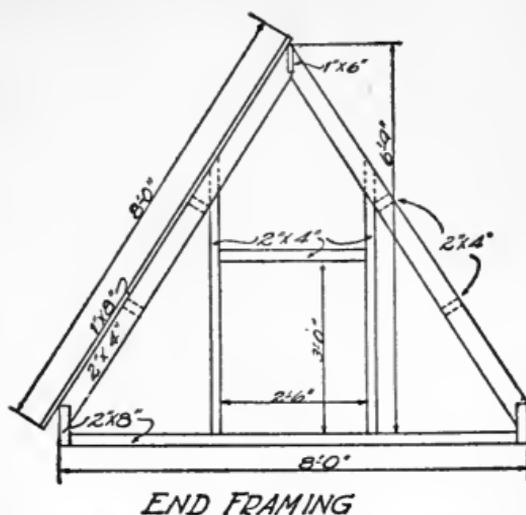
Cross Section Through A-Shaped Portable Hog House
